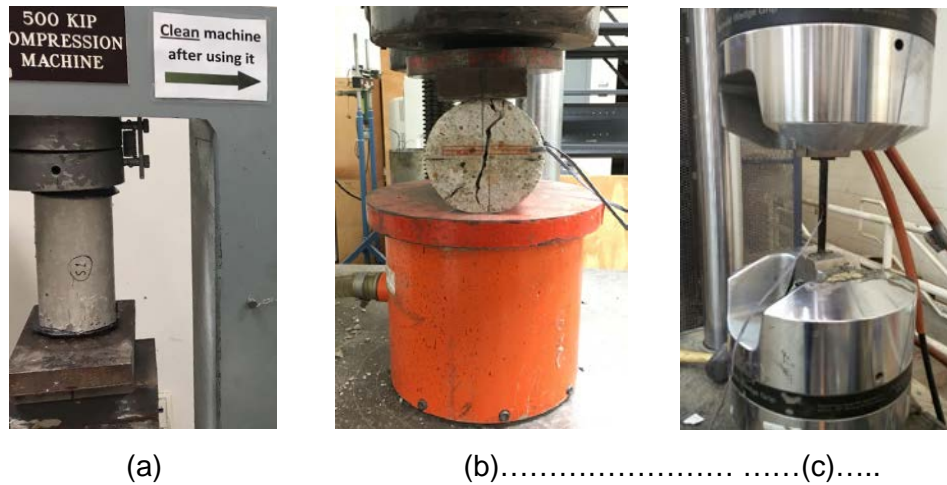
Cylindrical specimen and coupon tests: (a) concrete compressive strength; (b) concrete tensile strength; (c) CFRP tensile strength
